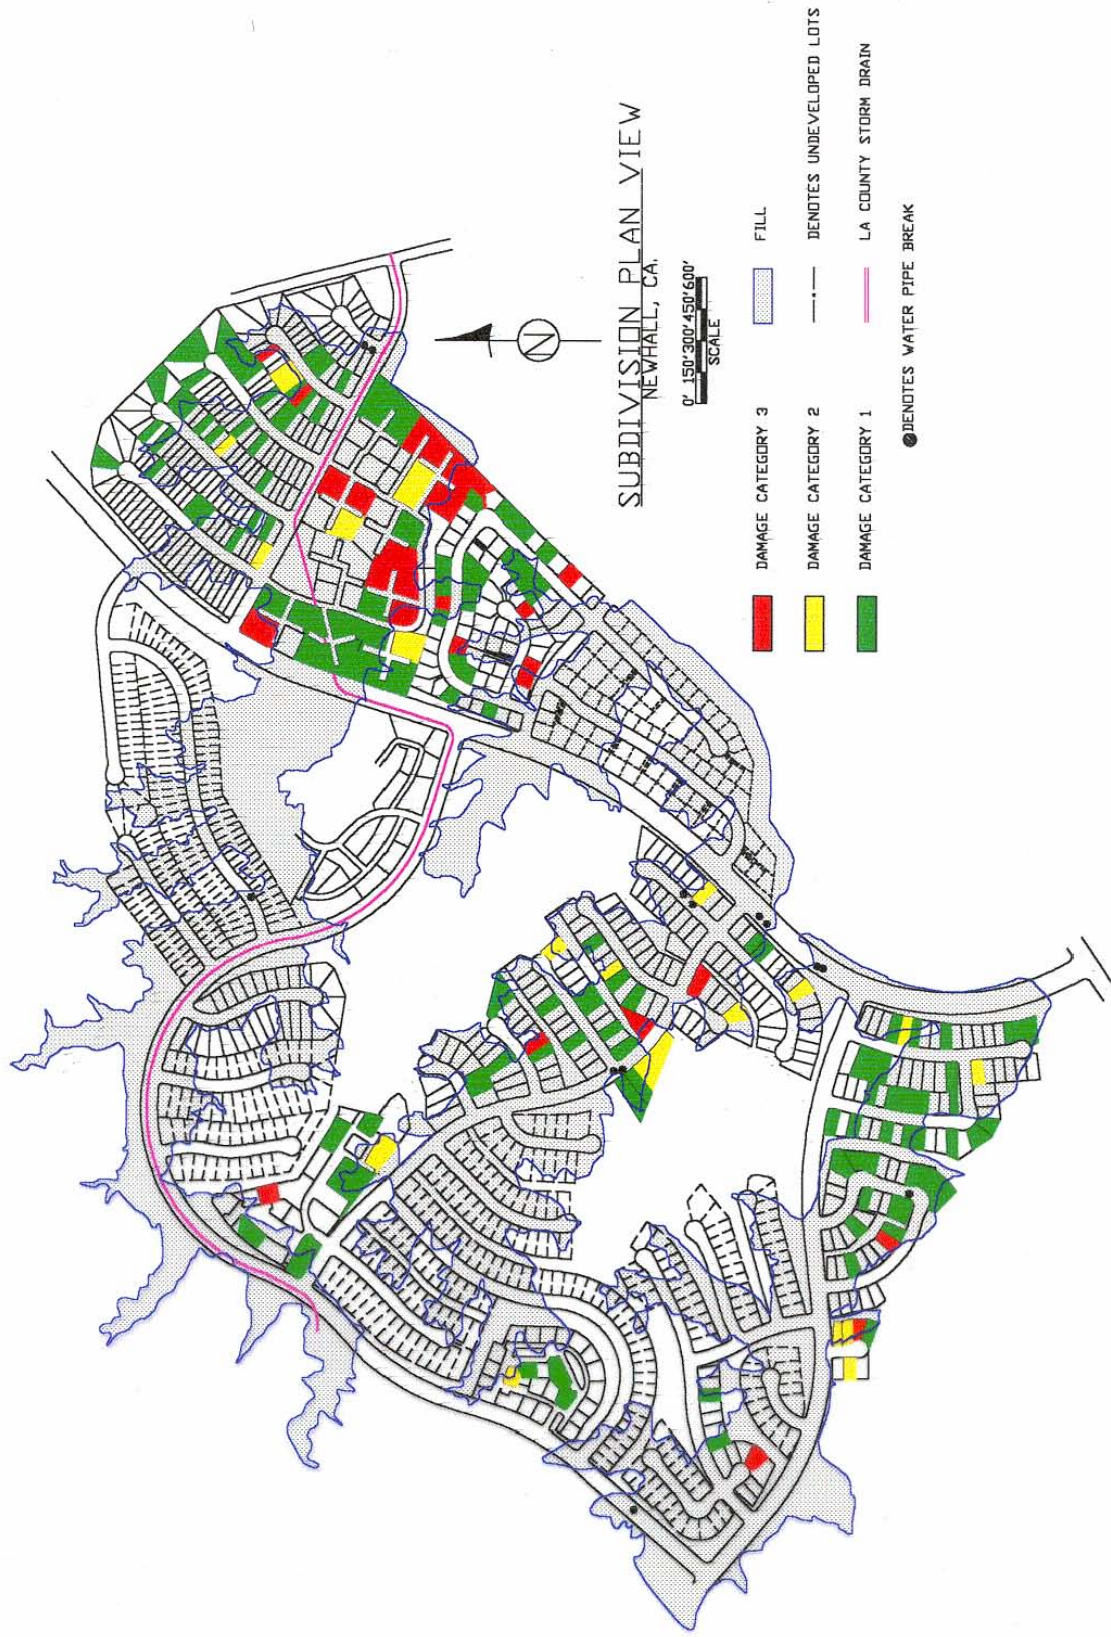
Plan view of subdivision showing fill and cut zones and locations of damaged water pipes and structures
